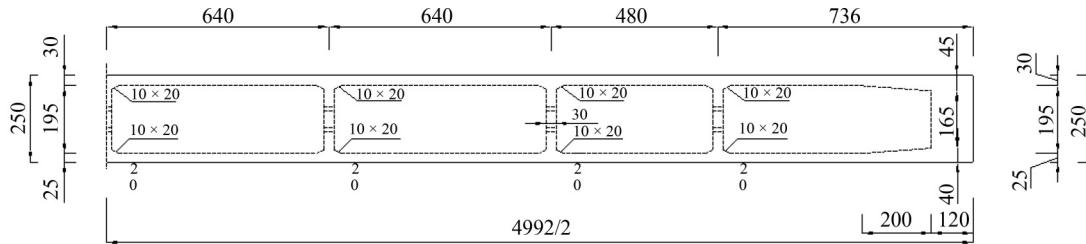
Profile of the box girder with corrugated steel webs (cm).
